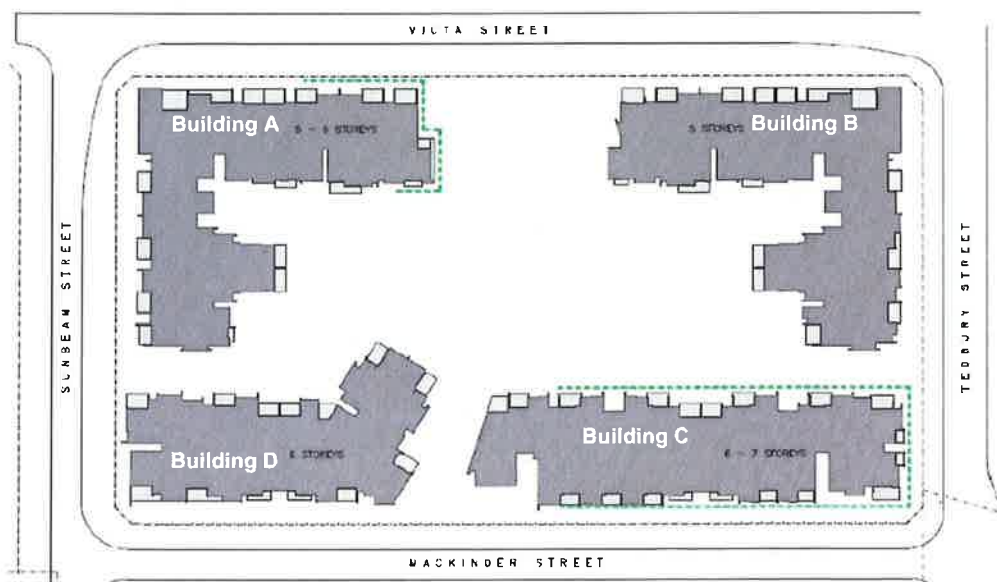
Proposed building footprints and location of areas of additional building height (shown with the dashed green line)
